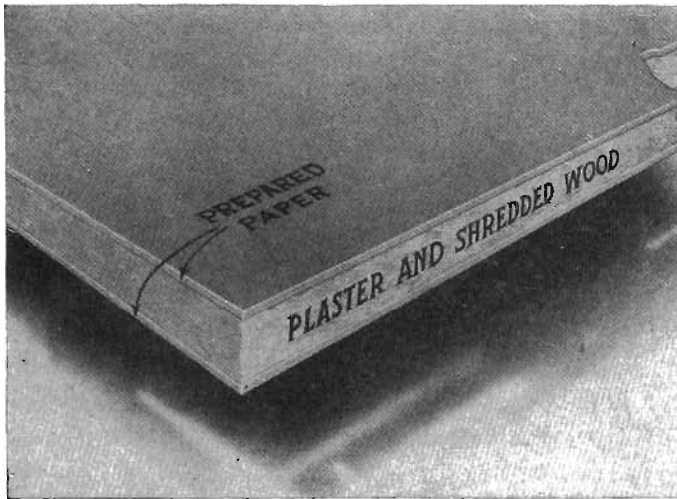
Section of gypsum wall board. Courtesy of Beaver Board Co.
